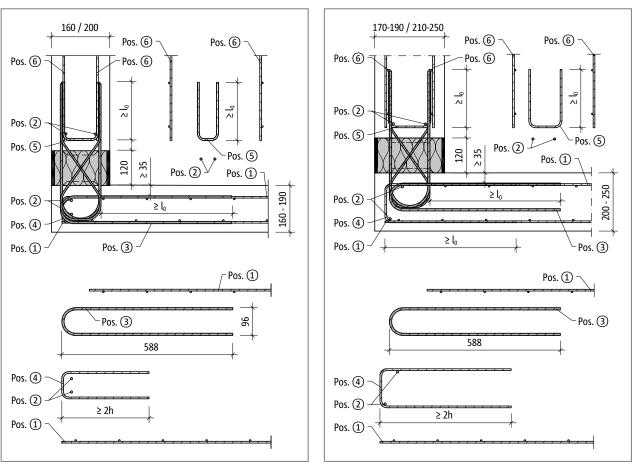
Schöck Isokorb® XT type A: On-site reinforcement on the inside (B = 160 and B = 200)
